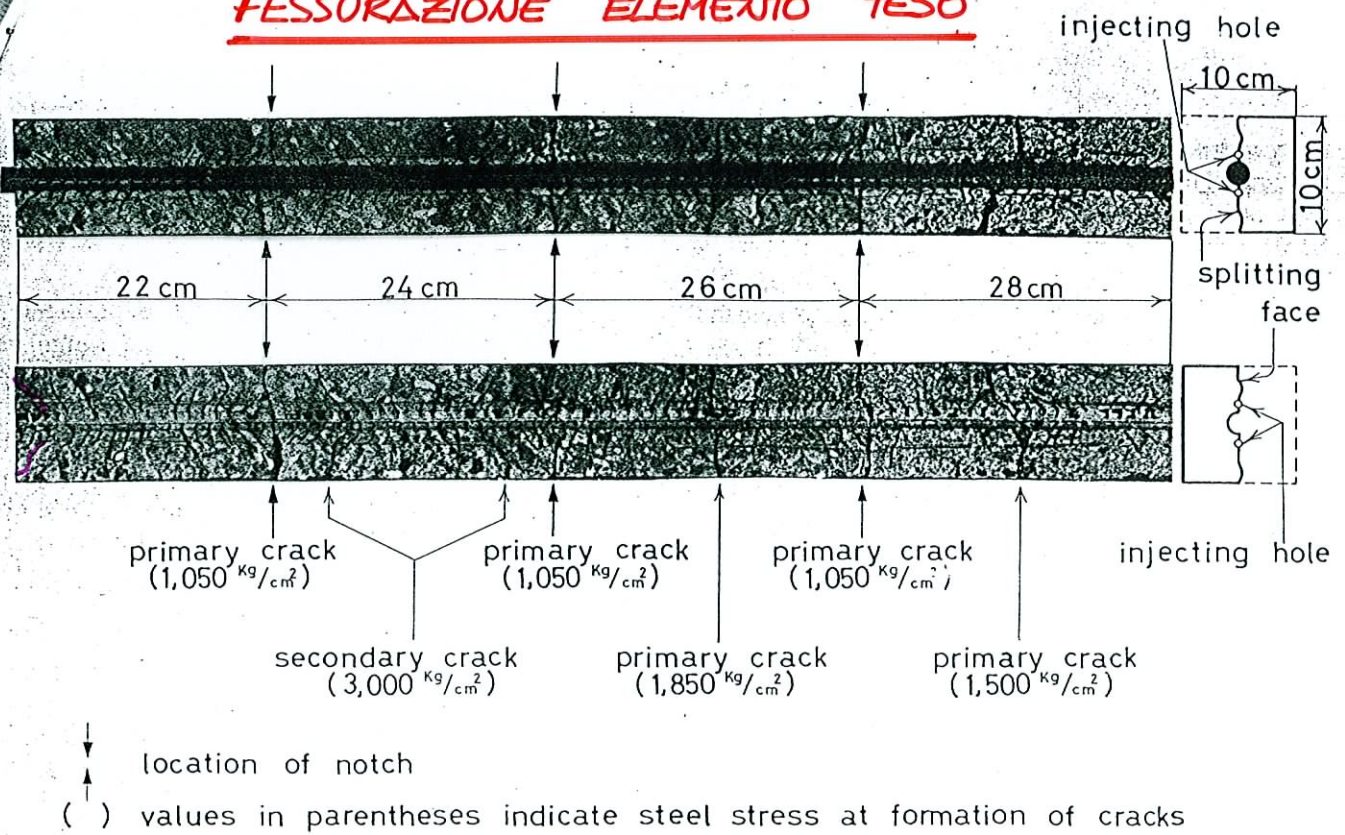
Internal crack and secondary crack with 3/4 in. (19 mm) bar, longitudinal splitting face and cross section
